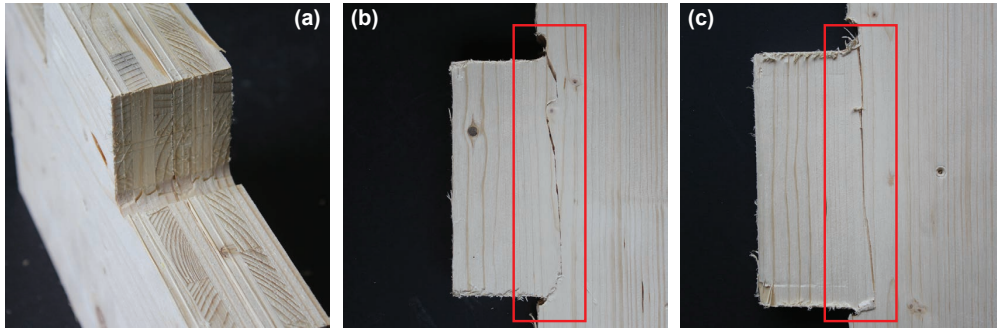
Failure photographs of T5 specimens: (a) Axonometry (b) Side view 1 (c) Side view 2.
